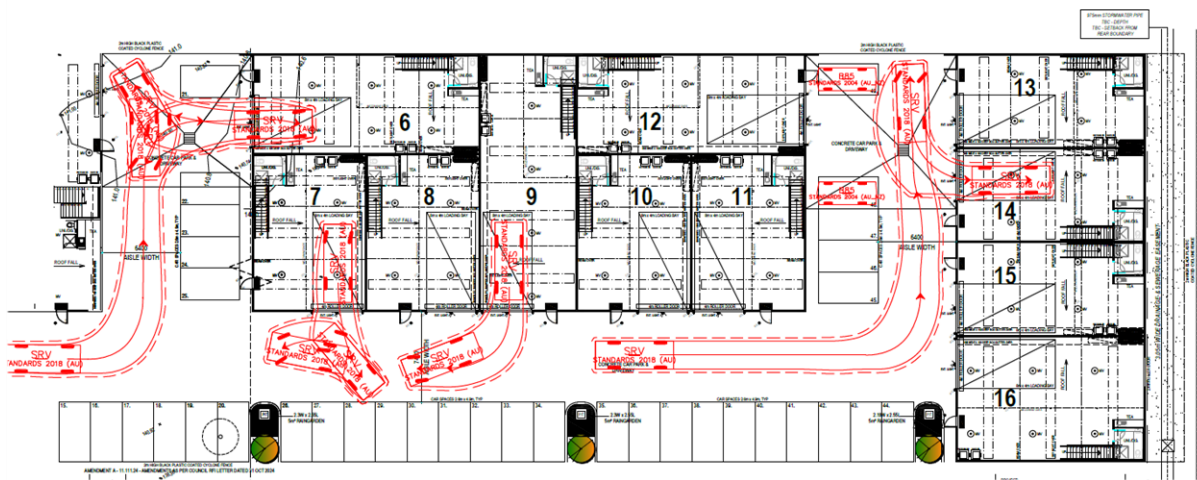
FLOOR PLANS (WAREHOUSES 6 TO 15)
